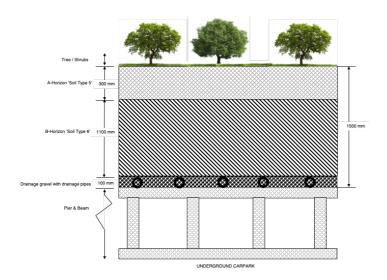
Lightweight A-Horizon 'Type 5' and B-Horizon 'Type 6' soil profile for general garden plantings.
